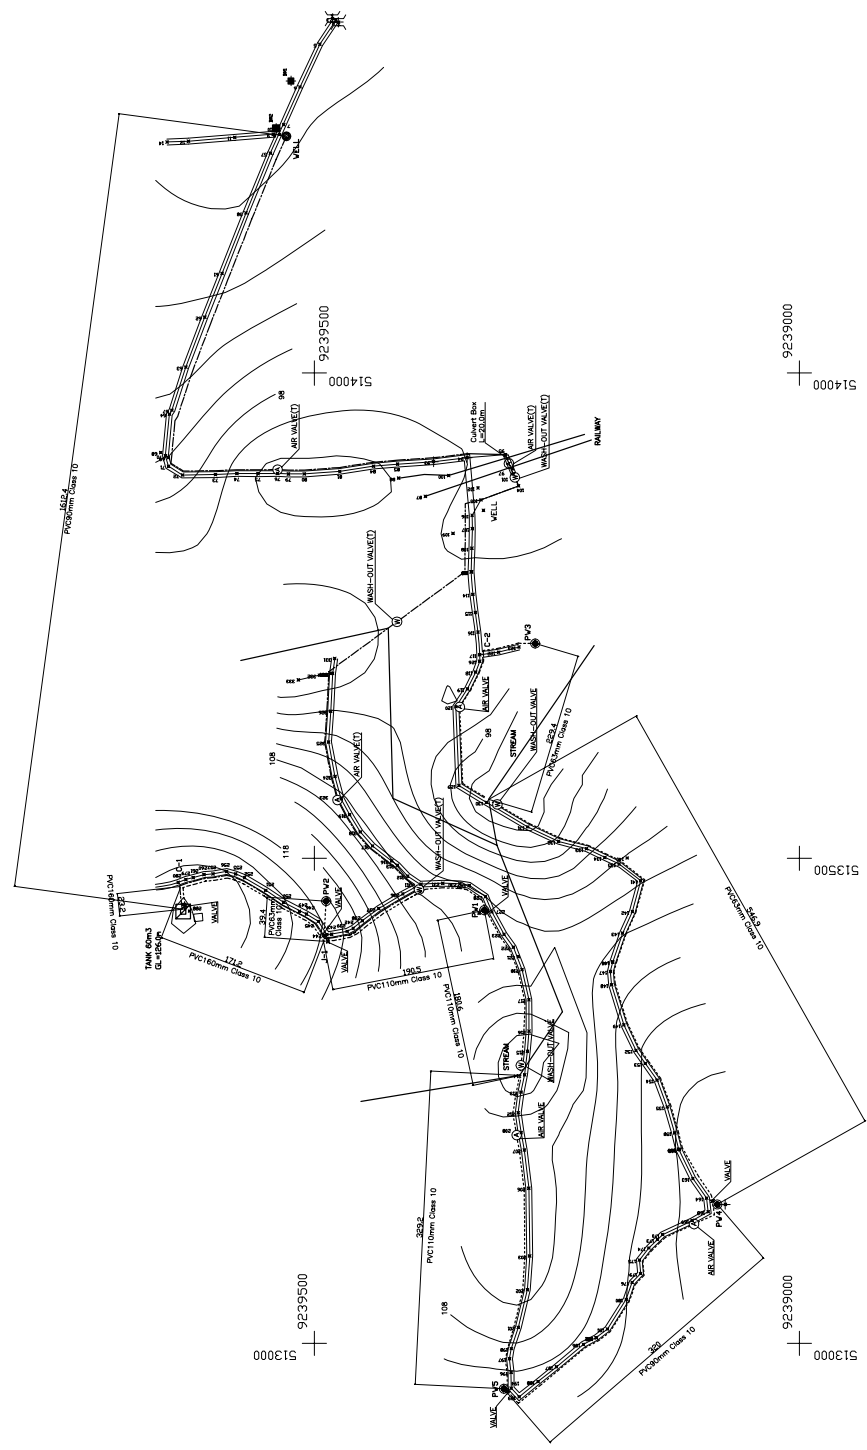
Layout Plan of Water Supply Facility (Msongola)
